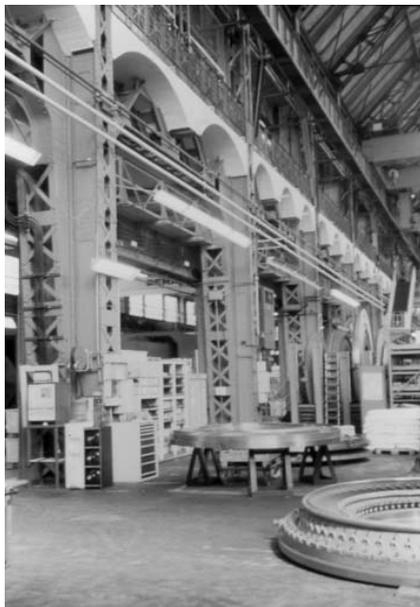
AEG turbine fitting shop, view to the aisle gallery with reinforced concrete cellar vaulting and to the node of the roof truss tie rod
